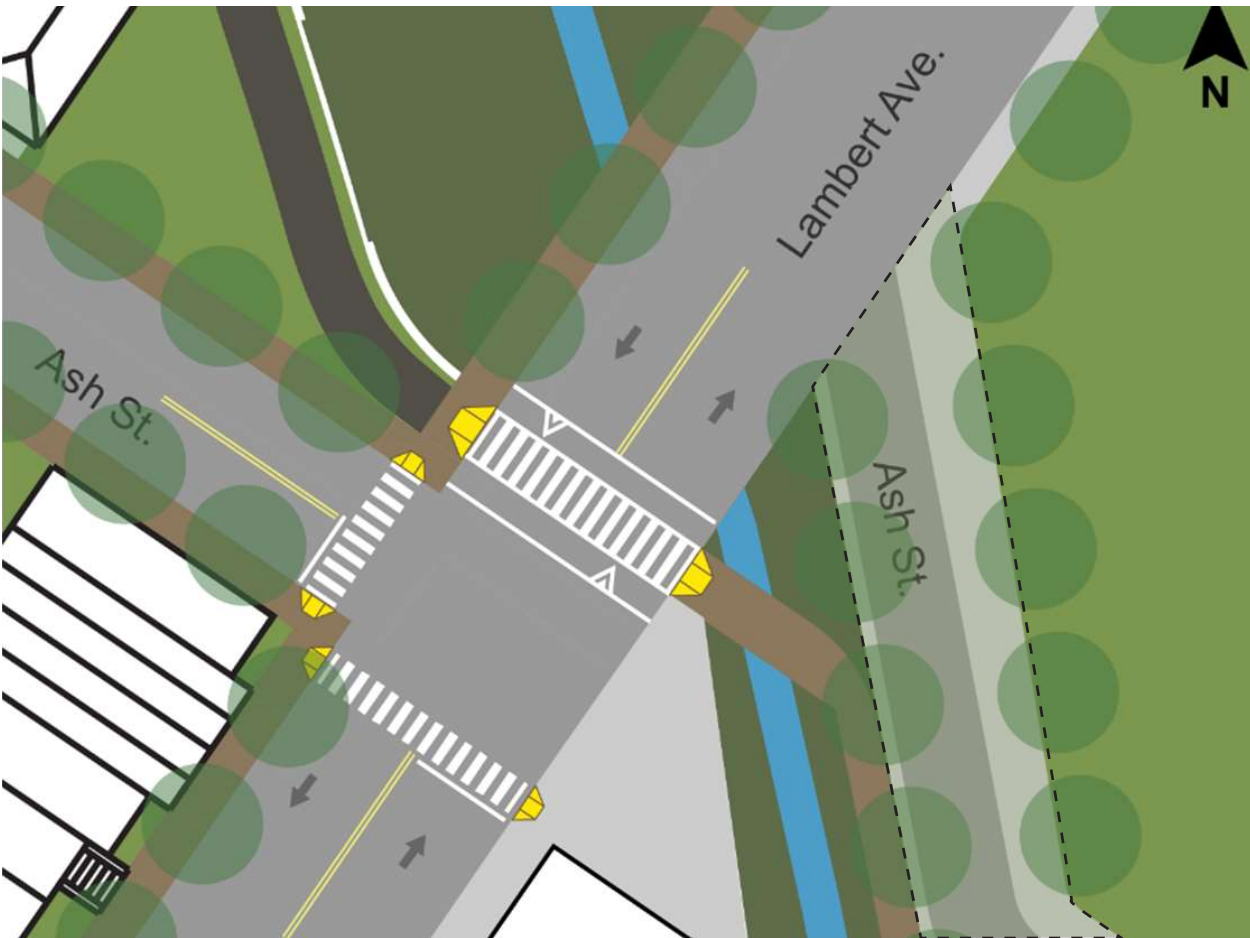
Lambert Avenue and Ash Street Conceptual Intersection Design
